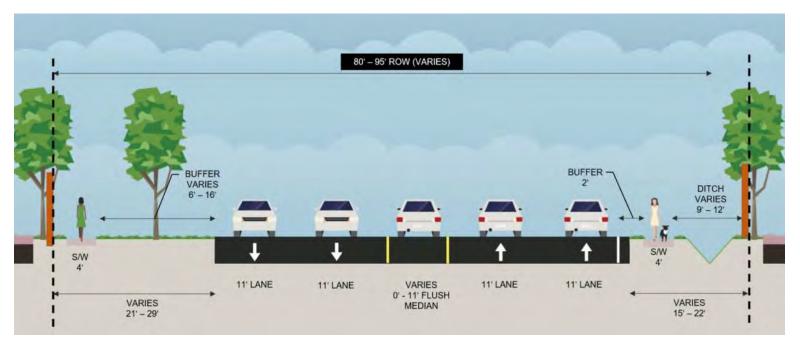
C Existing Typical Section: Memorial Drive - Frostwood Dr to Tealwood N Dr N.T.S.
